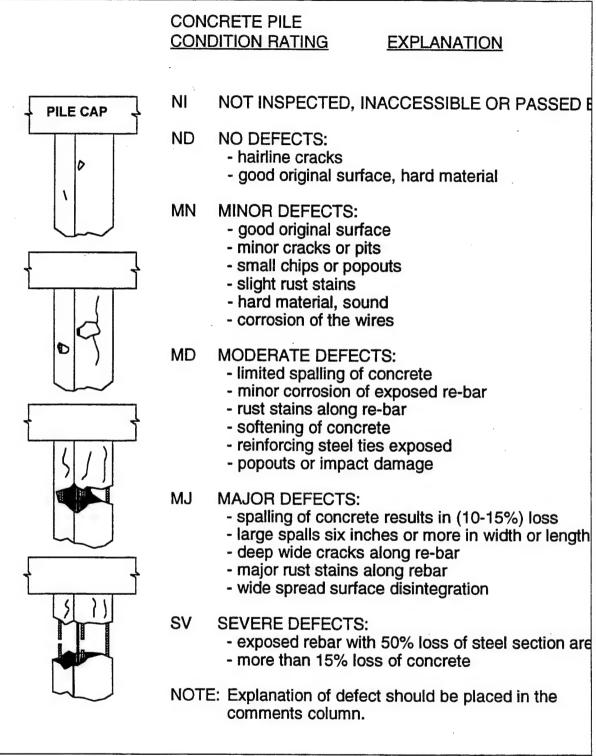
Explanation of pile condition ratings for concrete piles.
